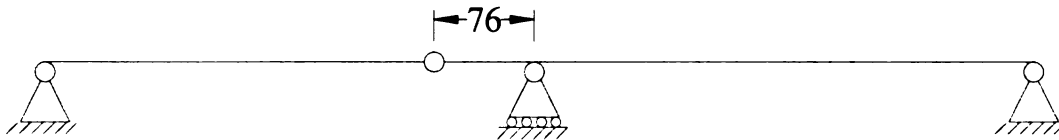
Diagram for simple/cantilevered steel bridges with 2 spans (unit: mm)
